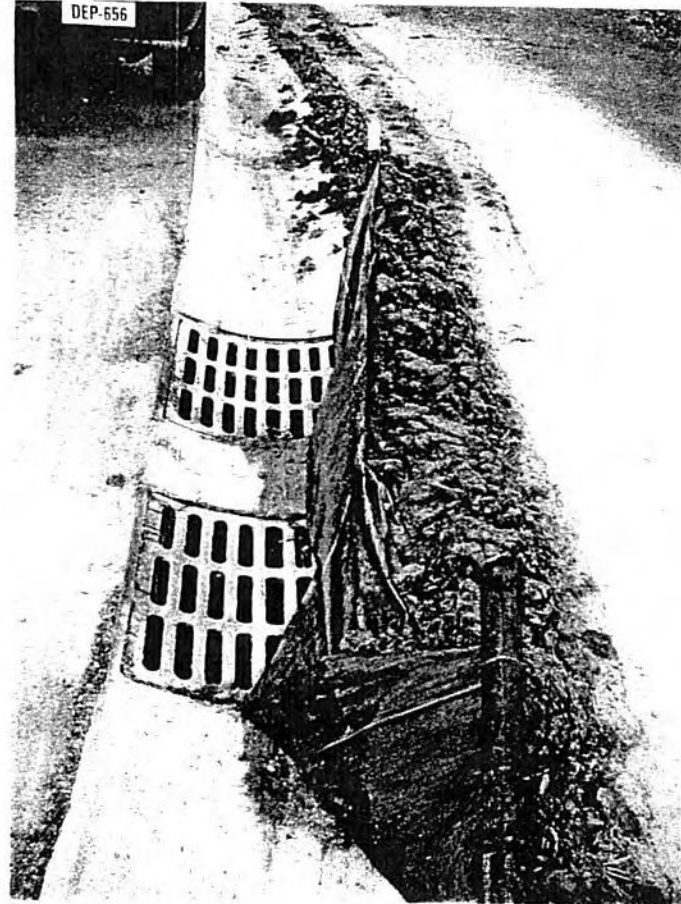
Additional inlet structures in Parcel 5 shown with no protective measure to prevent sediment loss. Also, the silt fence is not maintained/properly installed.
